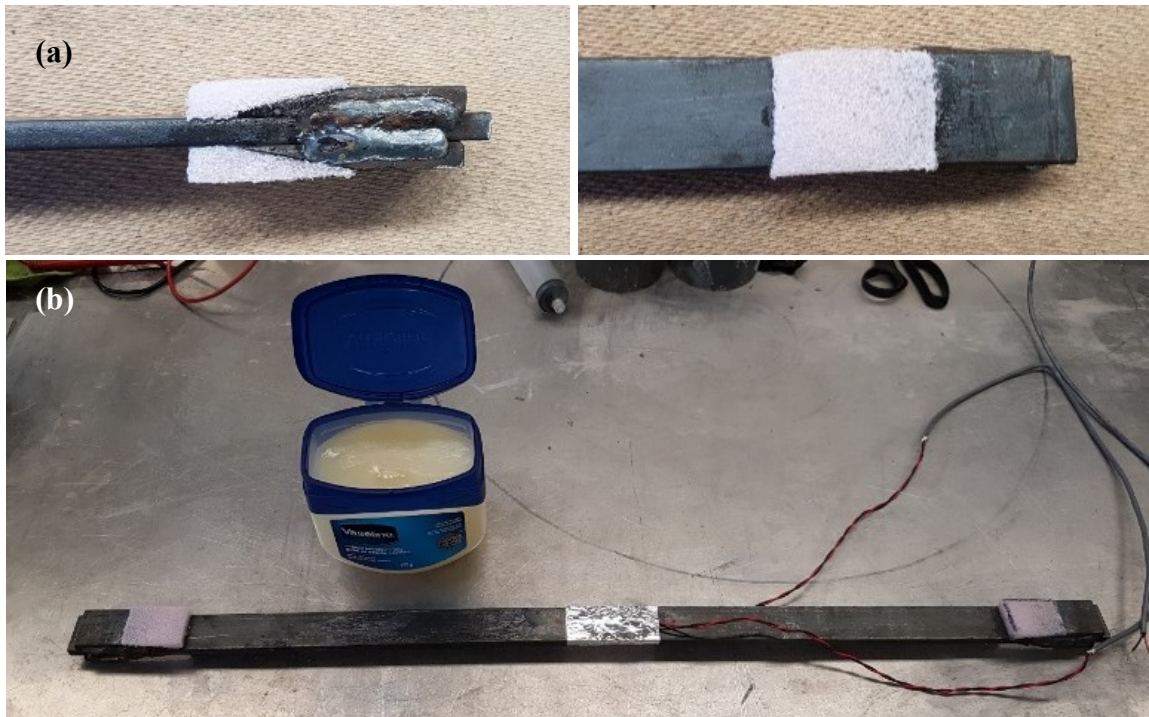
Details of steel cores: (a) expanded polystyrene on steel tabs; and (b) steel core coated in petroleum jelly.
